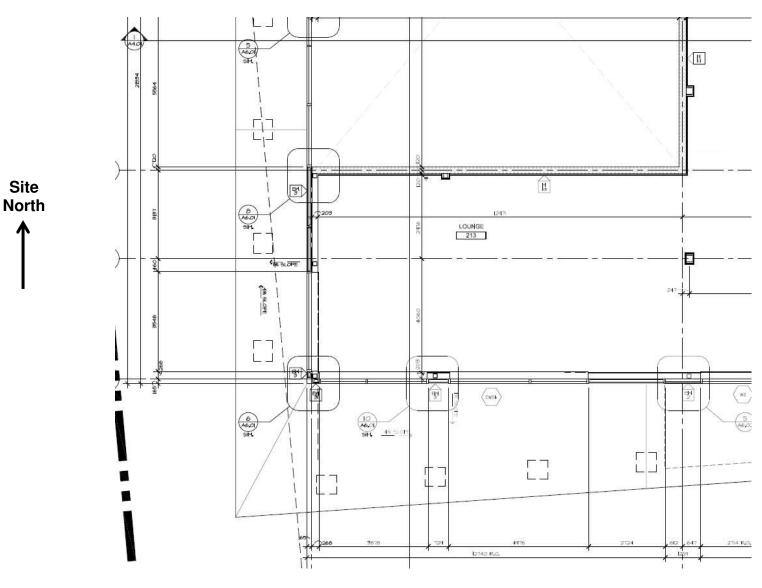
Layout of Multi-Purpose Room - Lounge (Room 213) – Worst Case Second Floor
